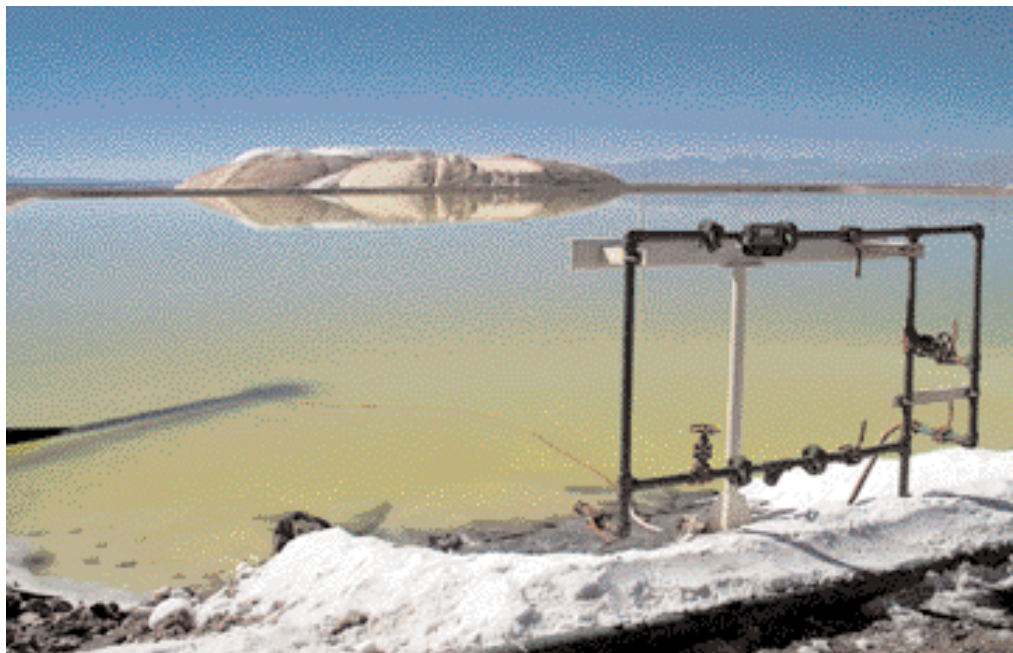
Pre-fabricated flexible PVC panels are seamed together on-site with solvent pressure. Brine is then pumped into the pits.
